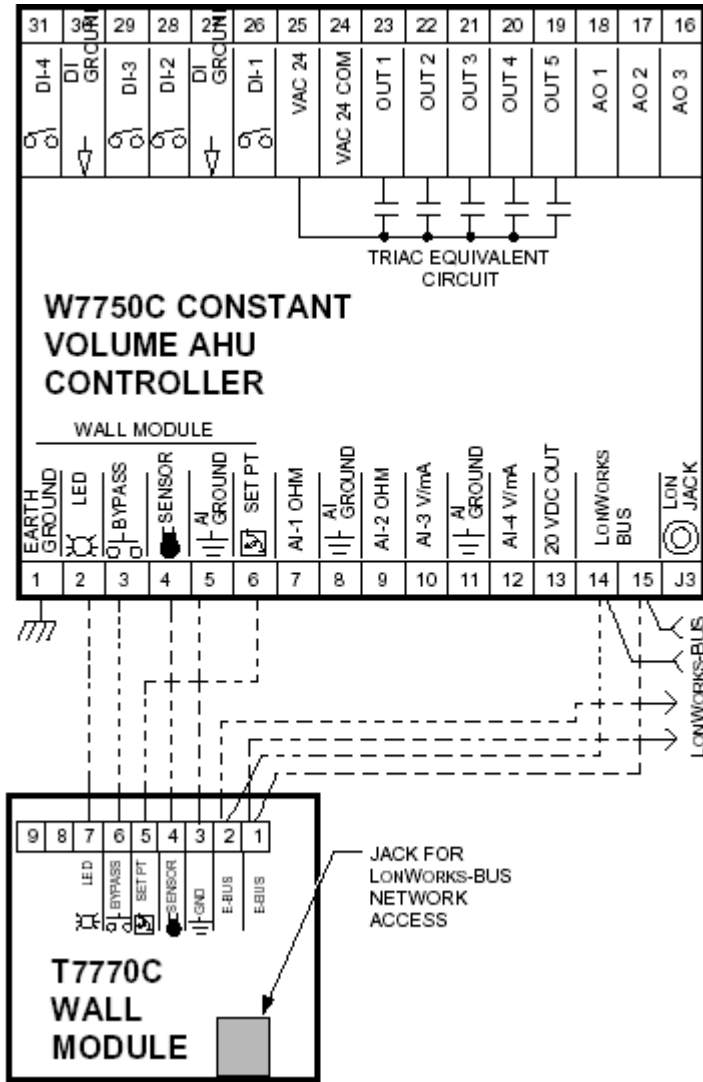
BUILDING AUTOMATION SYSTEM CONNECTIONS
